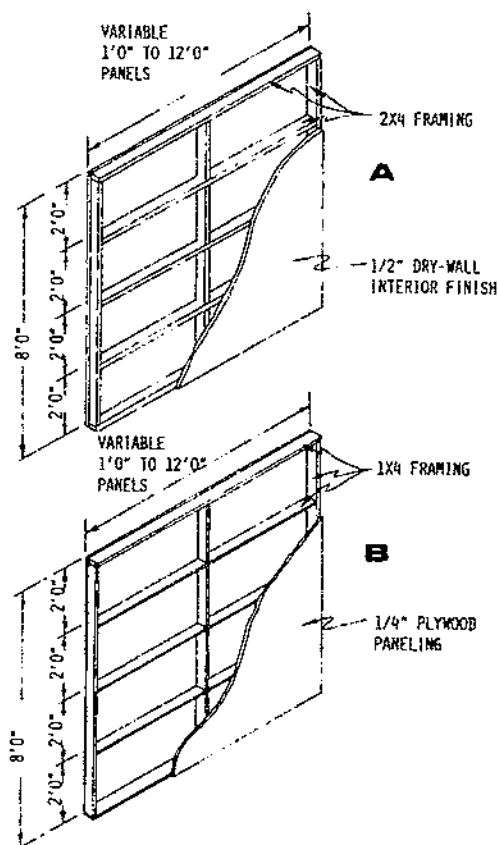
Original and redesigned interior wall panels. *A*, Original panel with 2- by 4-inch framing and 1/2-inch dry-wall finish. *B*, Redesigned panel with 1- by 4-inch framing and 1/4-inch plywood finish.
